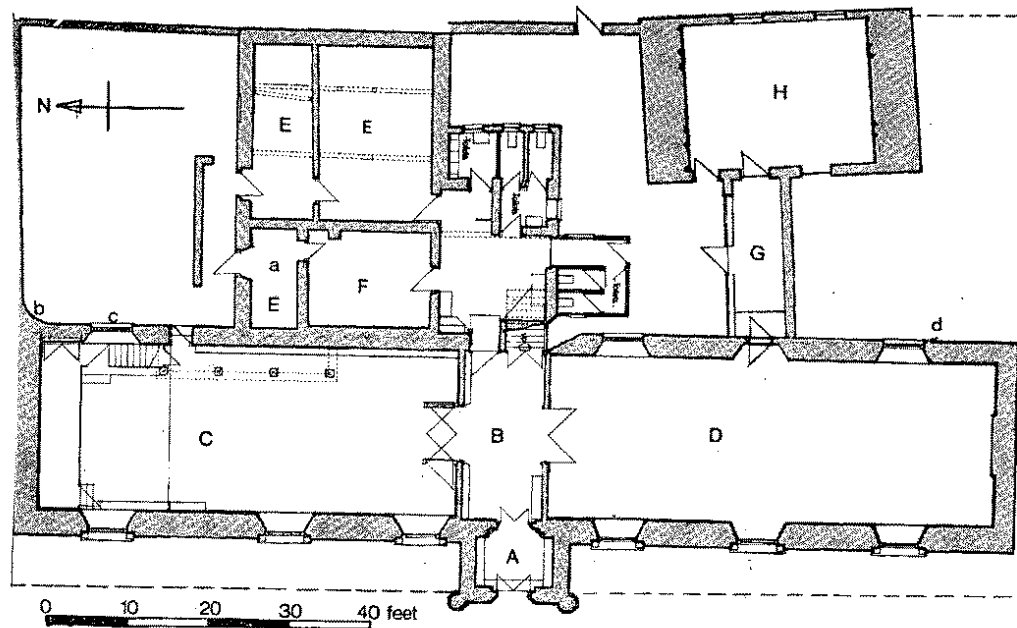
Plan of ground floor – Bury St Edmunds Cathedral
